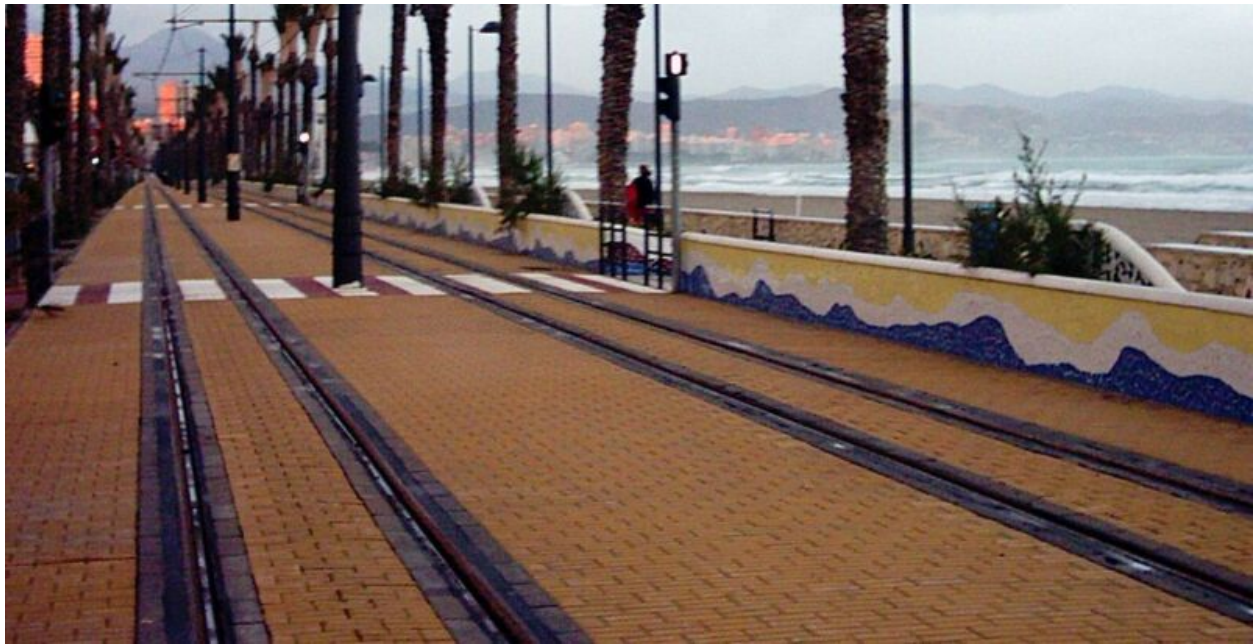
Pedestrian protection wall at Alicante's newly built LRT system. (photo by D. Moncholi)
